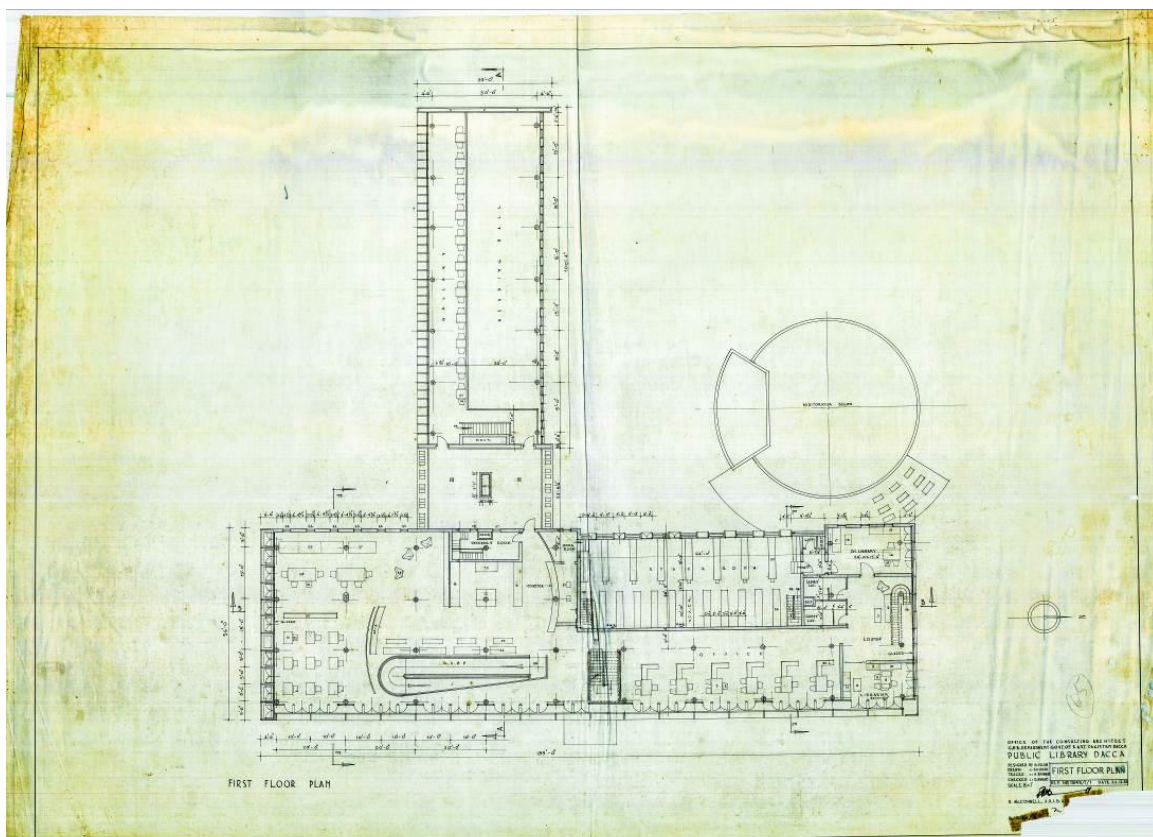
First floor plan Office of Consulting Architect. CBB Department of Cont. Of East Pakistan Dacca. Public Library, Dacca.
